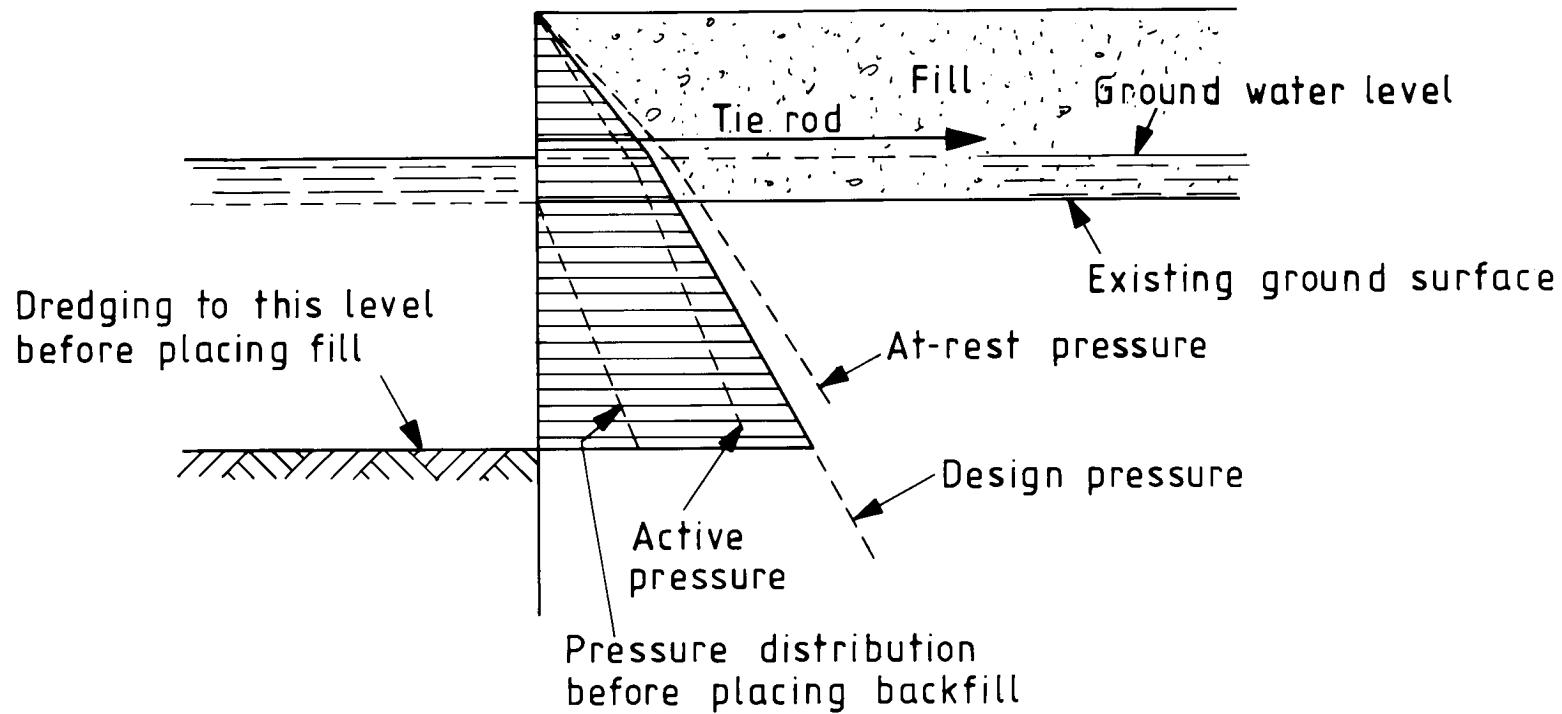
Active pressure distribution on anchored single-wall structure where filling is placed after dredging
